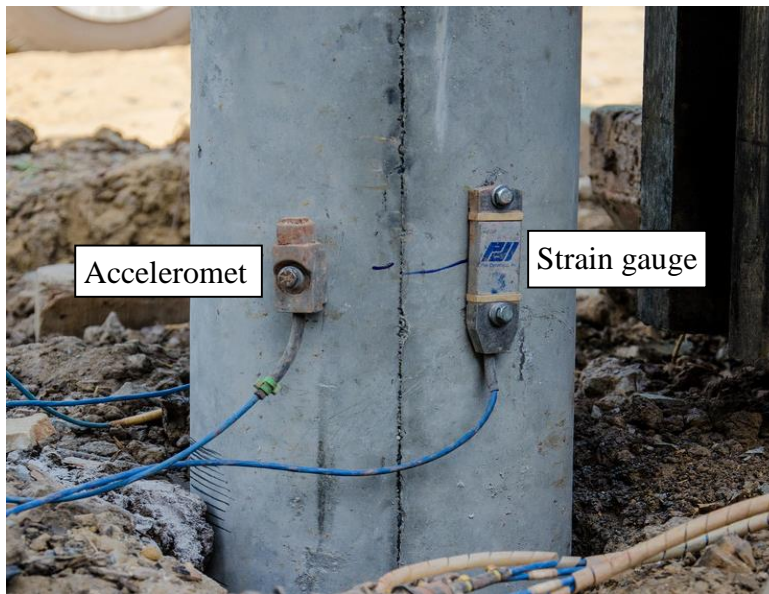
Installation of sensors to a precast concrete pile for DLT³.
